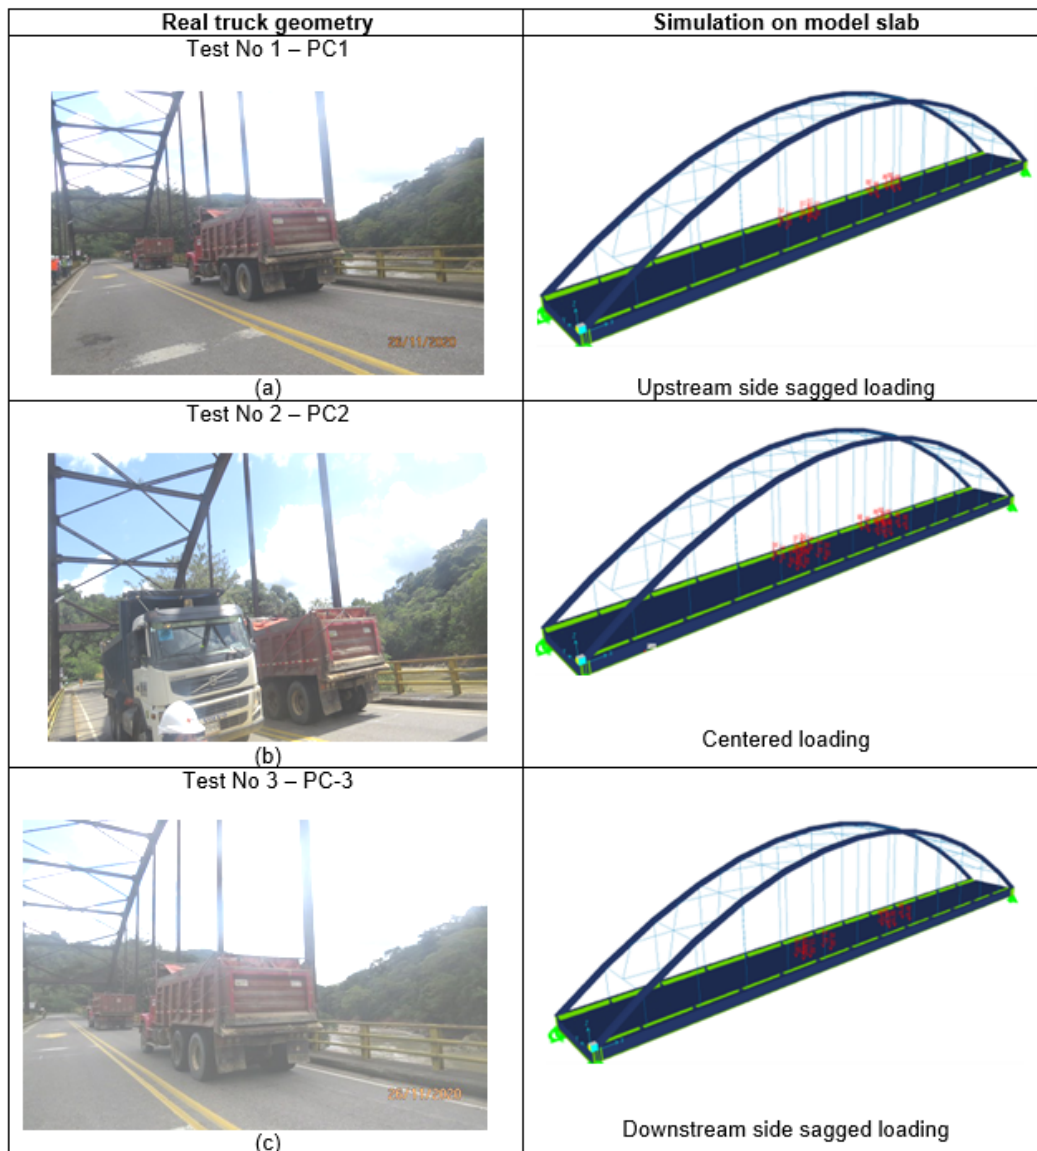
Truck localization during the load test: a) eccentric load towards the upstream arch, b) centered case of loading, c) eccentric loads towards the downstream arch
